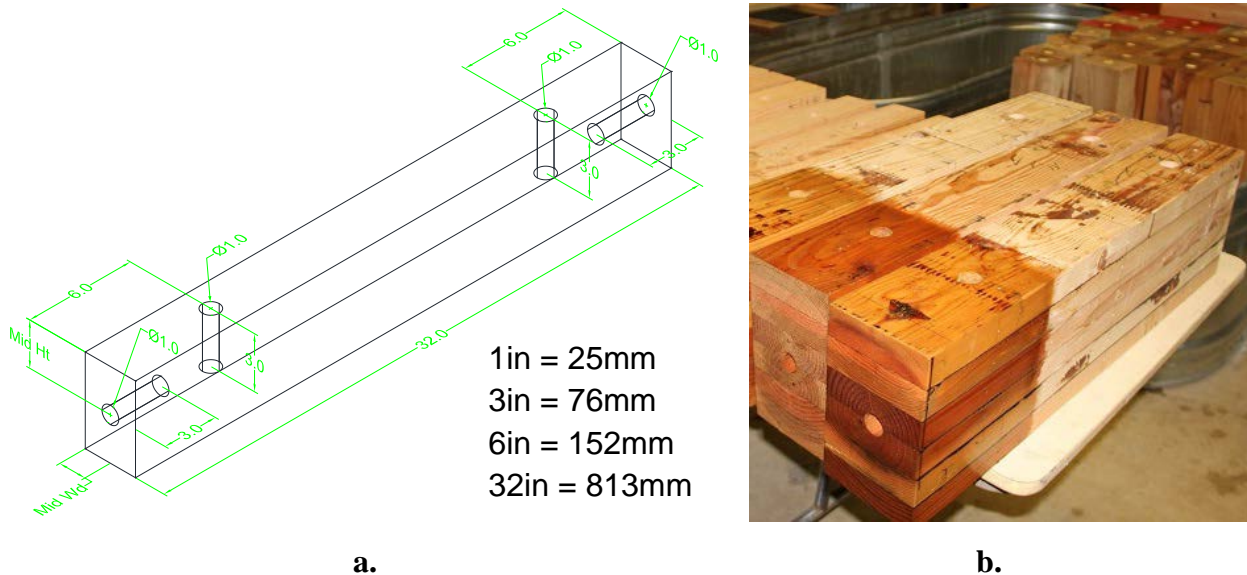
Fungal cavity holes in specimens: (a) locations of the drilled holes (units shown are inches); (b) holes drilled in a six-laminate glulam.
